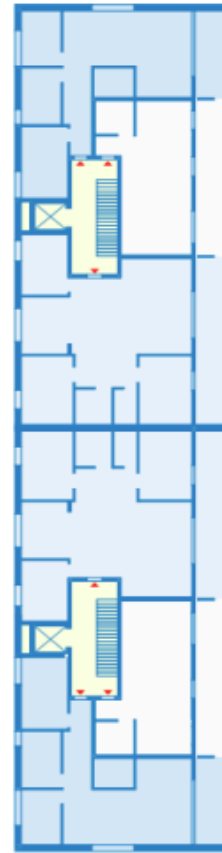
Example drawing of common single-staircase building(s) layout (also known as point access blocks).
